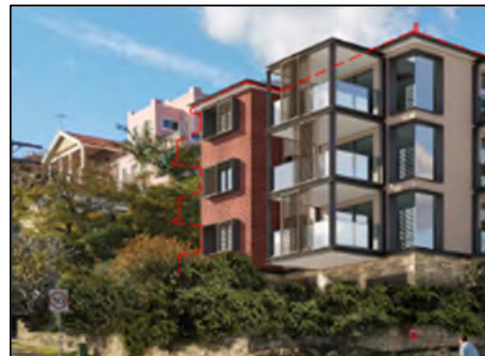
View looking west along Warung Street showing views toward and over the site from properties on the northern side of Warung Street
